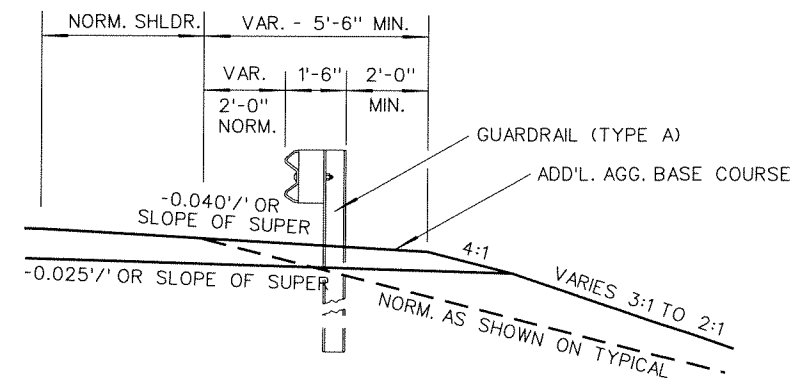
DETAILS OF GUARDRAIL OVER HEWING AND LICK CREEKS
